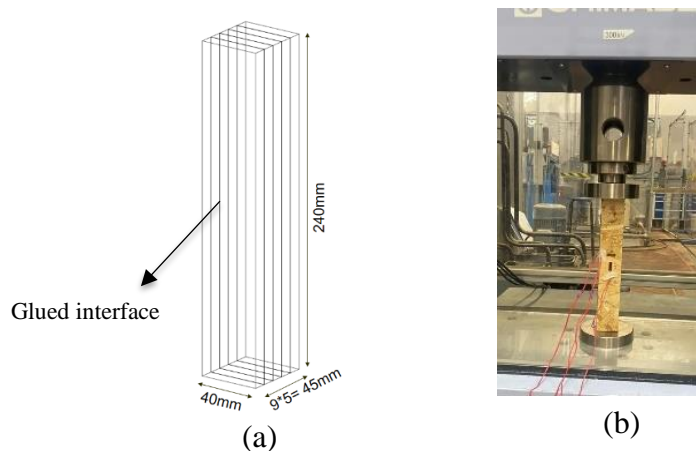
OSB compressive coupons: (a) dimensions in mm and (b) test set-up
